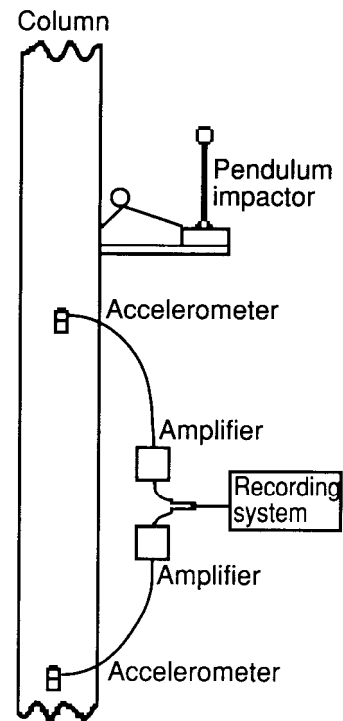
Instrumentation utilized to test wood members in water cooling tower.
